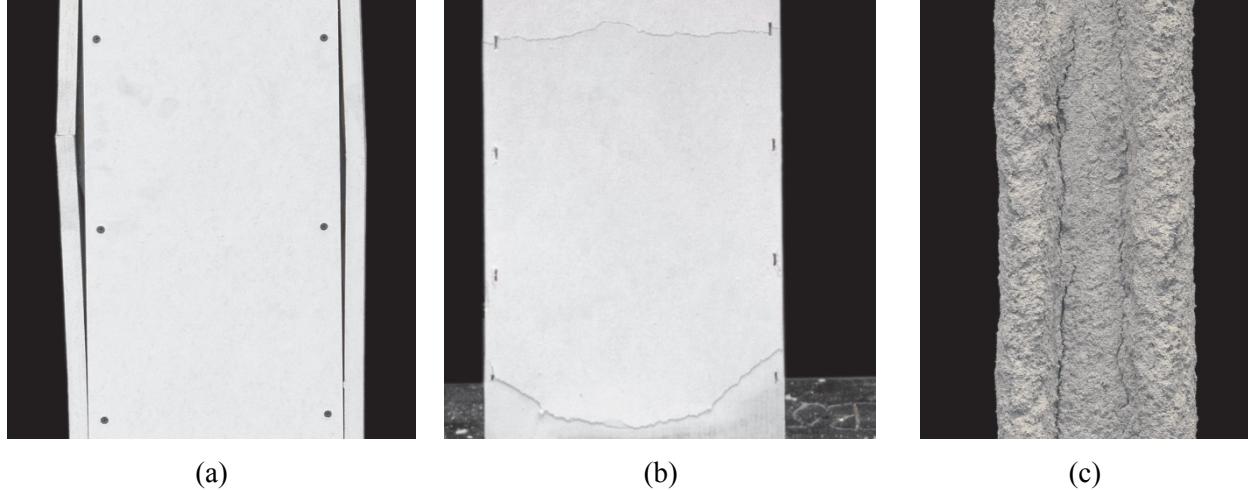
Damage on the fire protection elements due to the combination of seismic and fire actions: a) test#2 column B; b) test#3 column C; c) test#4 column D
